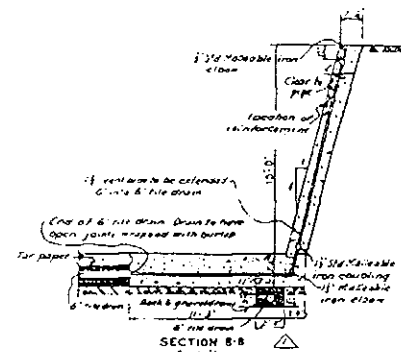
Cantilevered Reinforced Concrete Wall.
